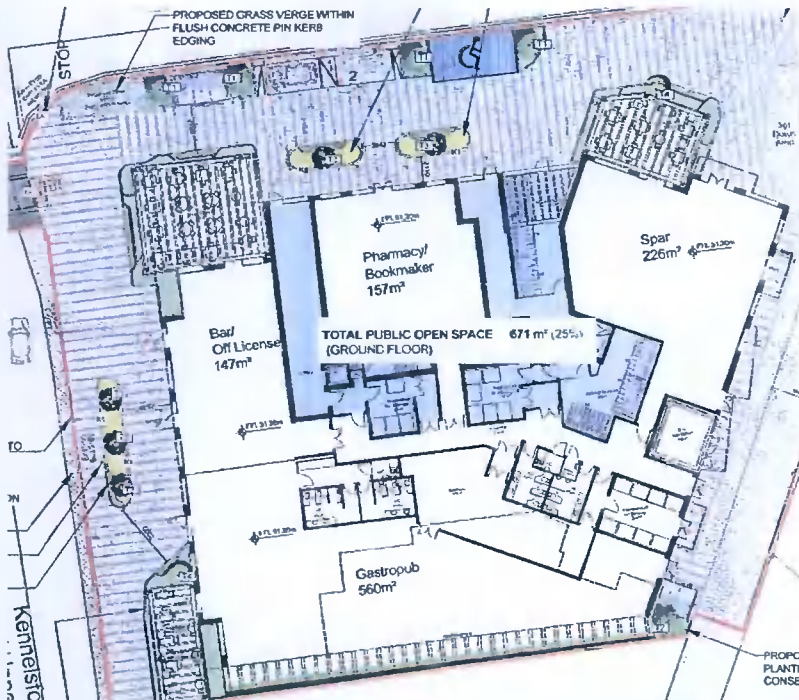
Applicant public open space proposals appear to be private external drinking/dining areas?
